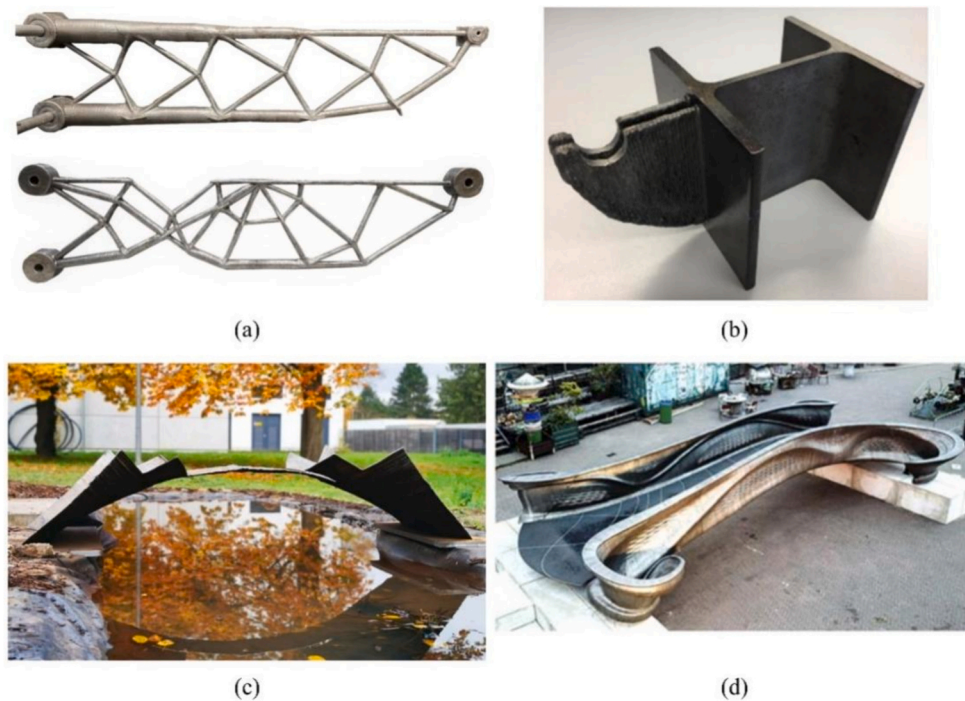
WAAM structures: (a) a cantilever truss [4], (b) a beam hook [6], (c) a small 3D printed footbridge in shell form [7], and (d) a MX3D metal 3D printed footbridge [3].
